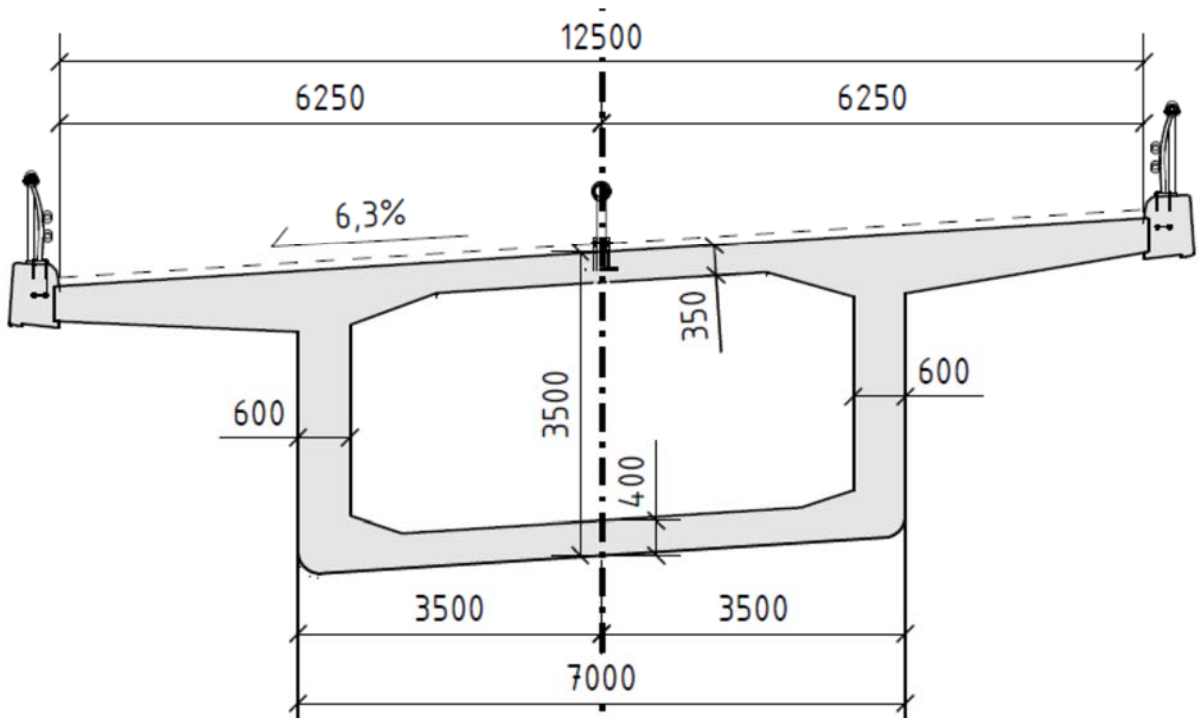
Cross sections of abutment and superstructure section, designed and programmed, segment phase, concrete variant
